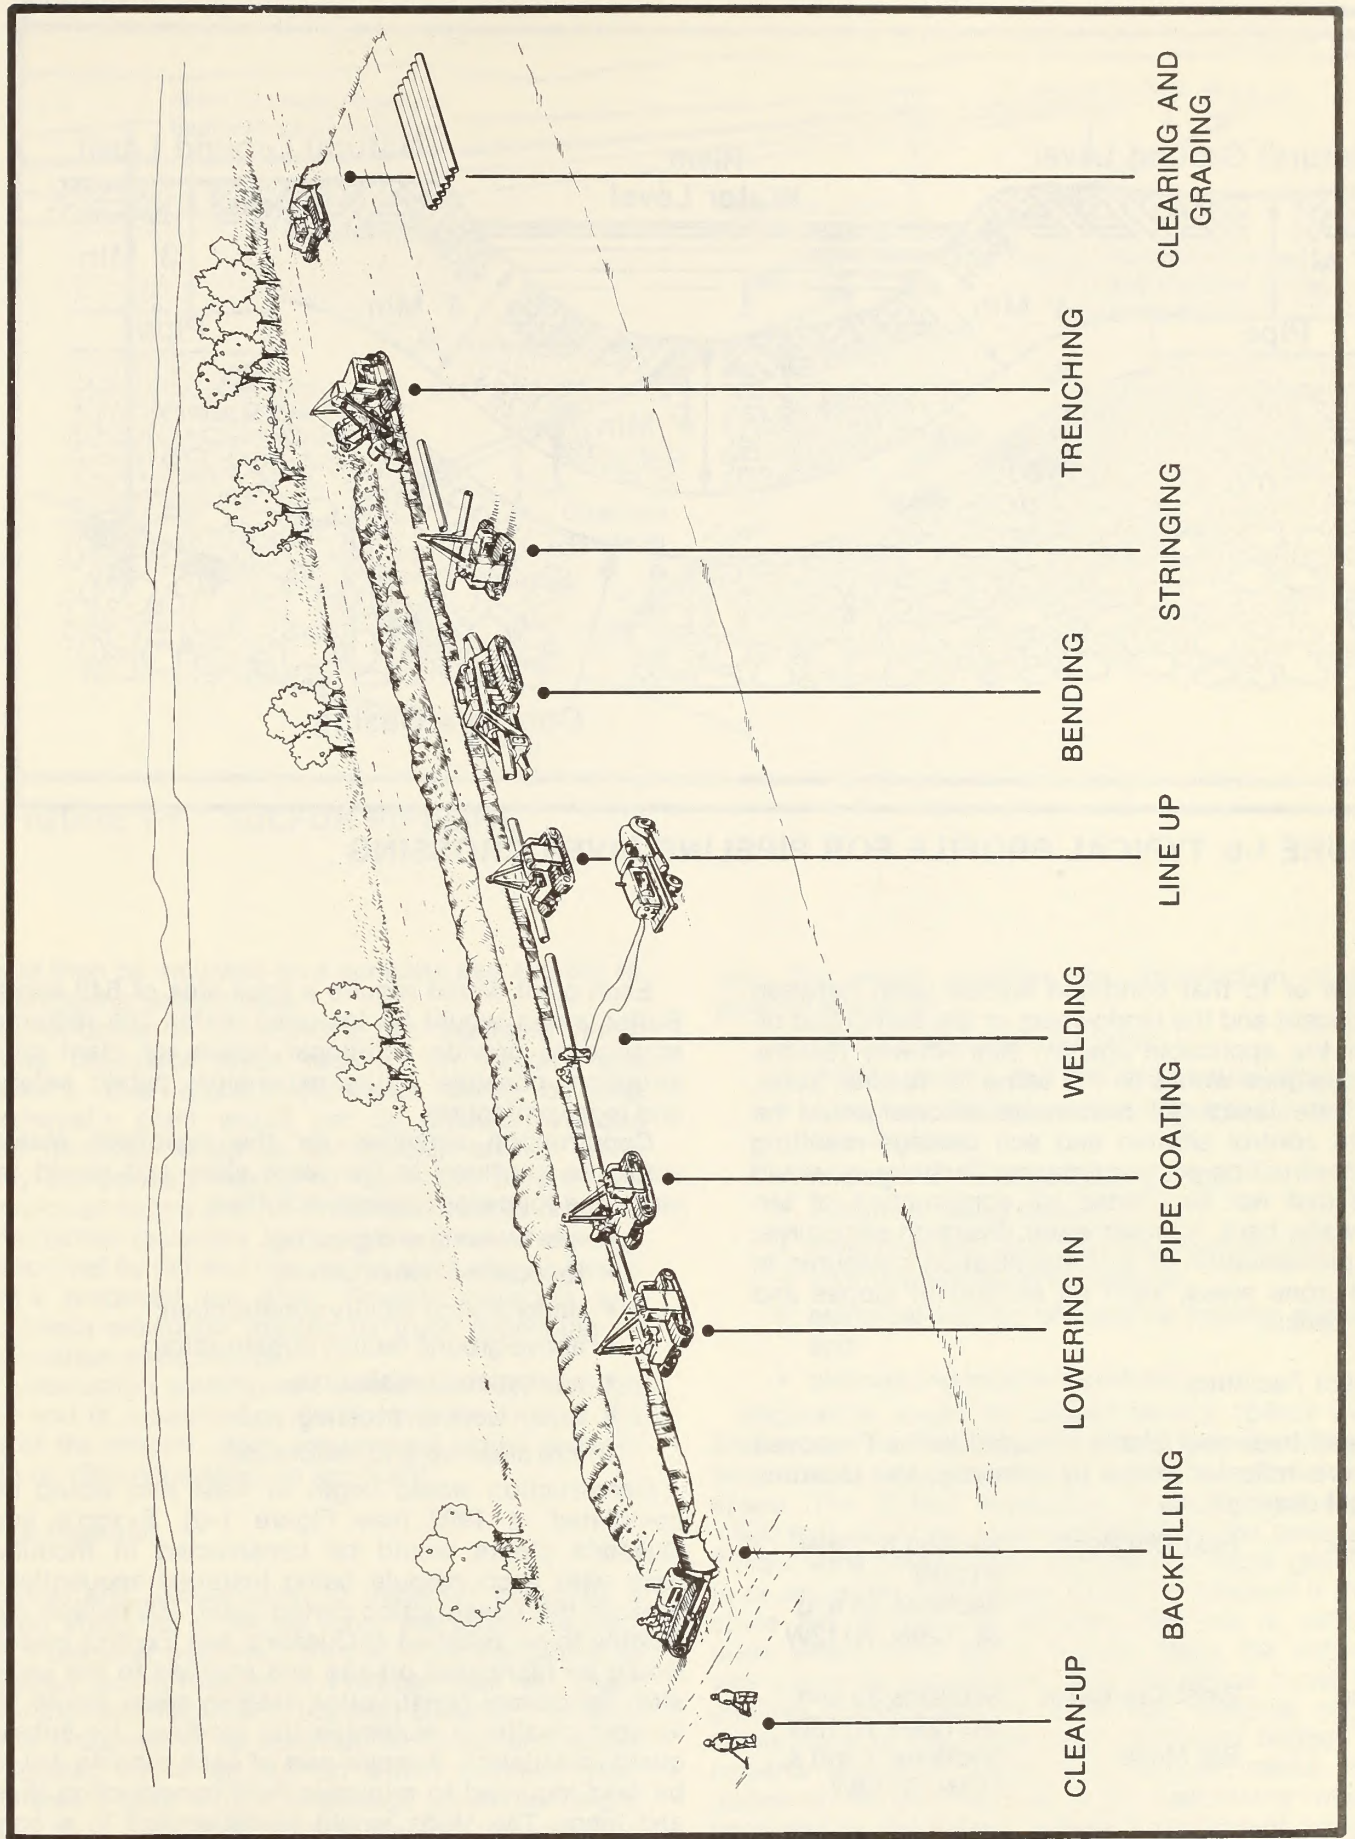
TYPICAL PIPELINE CONSTRUCTION SPREAD
